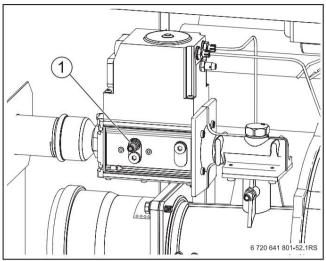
Bleed the gas line (boiler size 200 to 280 kW)
